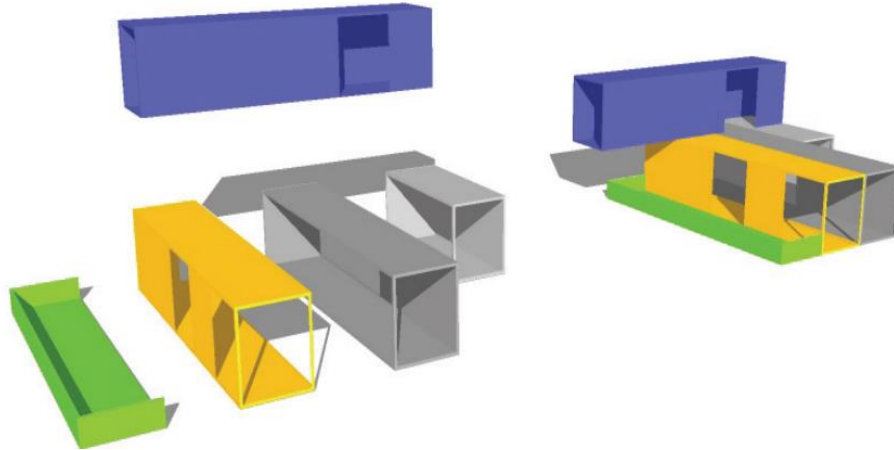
Example of openings and internal connections for a single-family house. (Luiz , Bernardo, & Araújo, 1-20)
